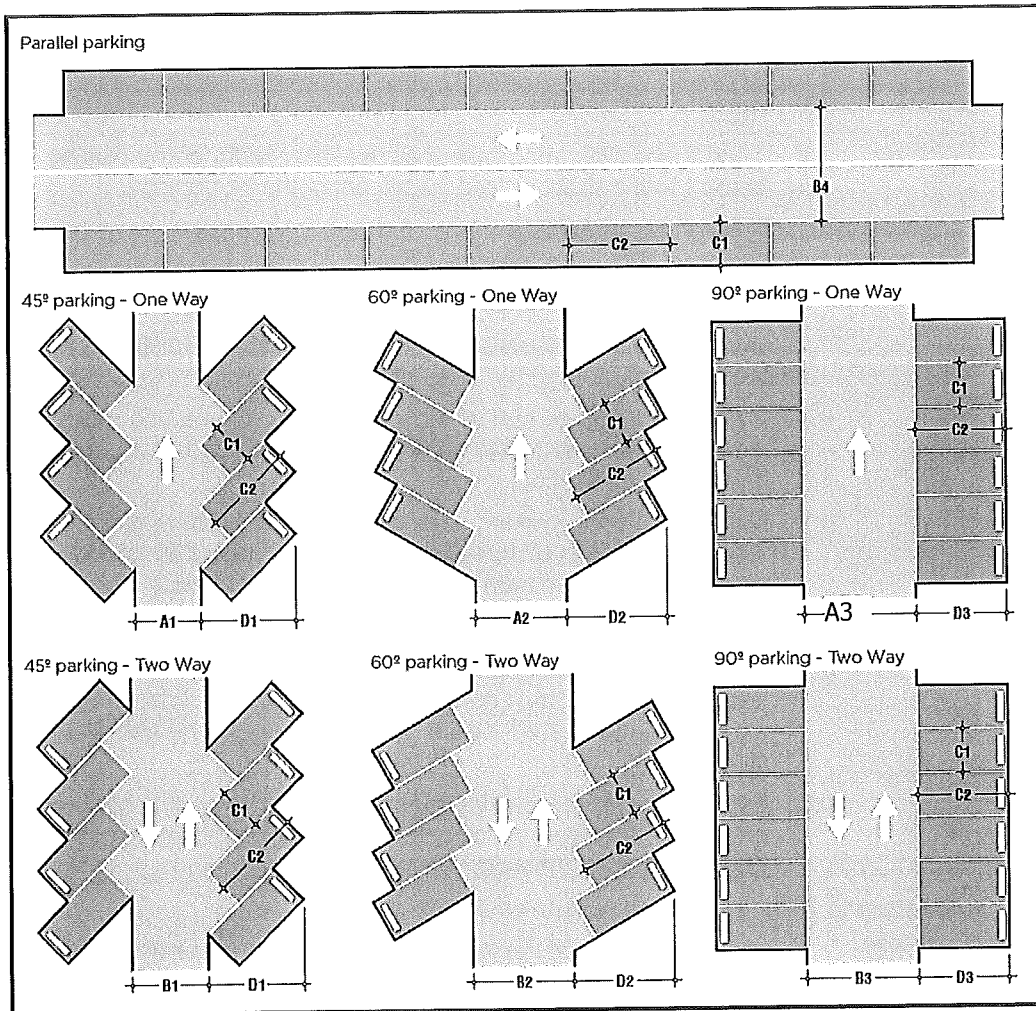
Parking Lot Stall, Aisle and Parking Bay Dimensions
